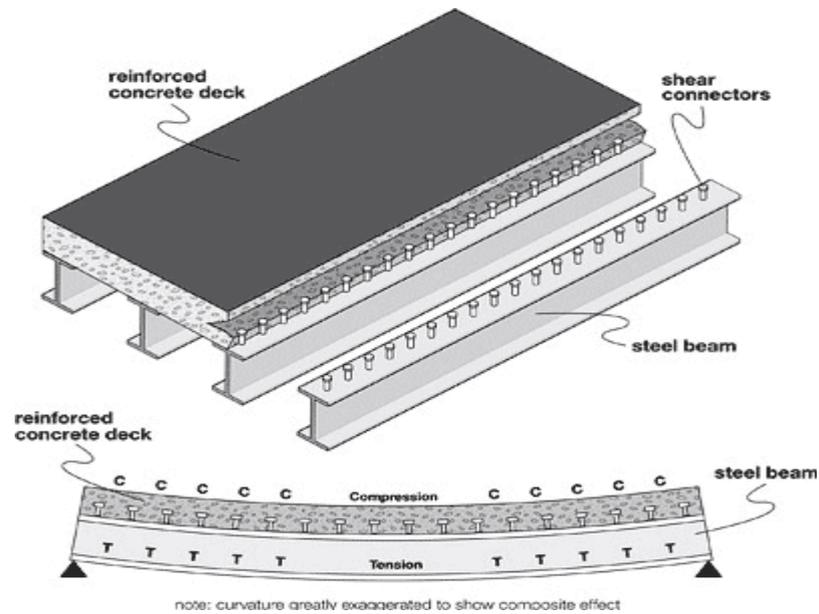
Typical Composite Beam Slab Details with shear connectors
